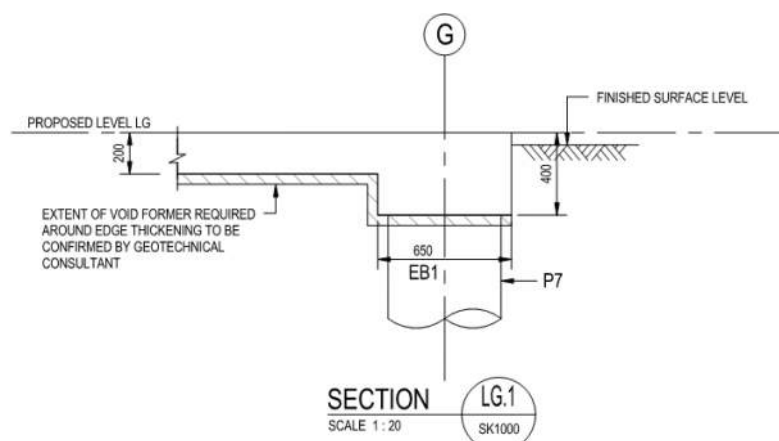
Typical slab and edge beam arrangement showing location of void formers.
